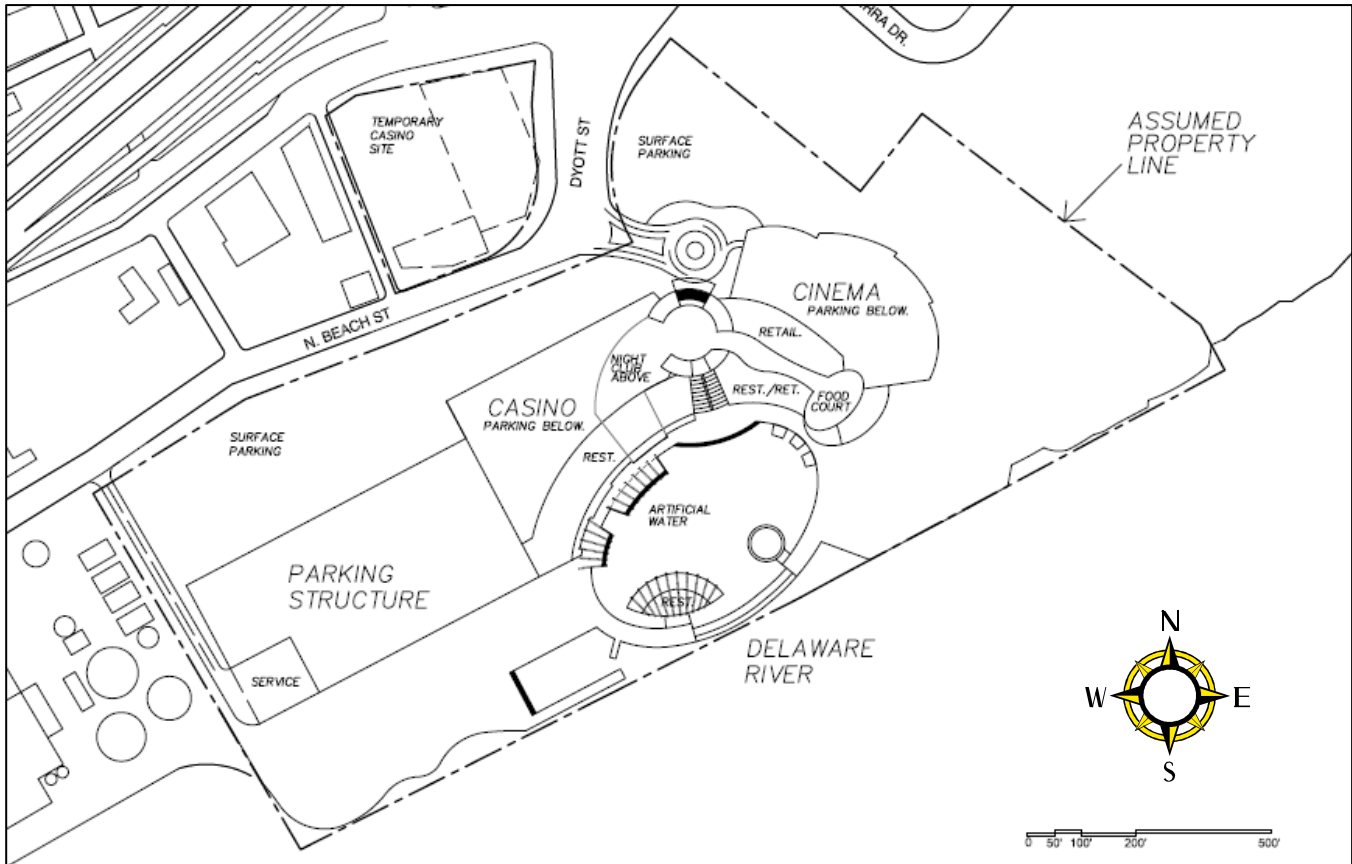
The composition of the Pinnacle Entertainment Project. This conceptual site plan indicates the general site layout, however, it is noted that the site plan is subject to refinement as the project is developed.
